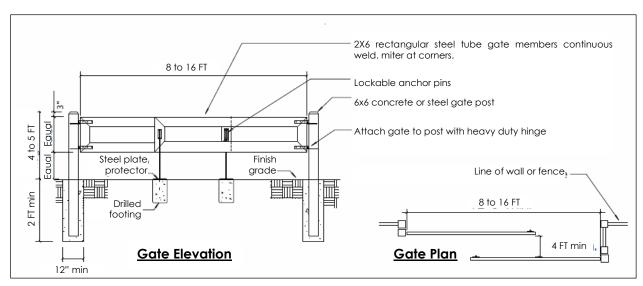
Equestrian Trail Steel Barrier Gate Entry Design
